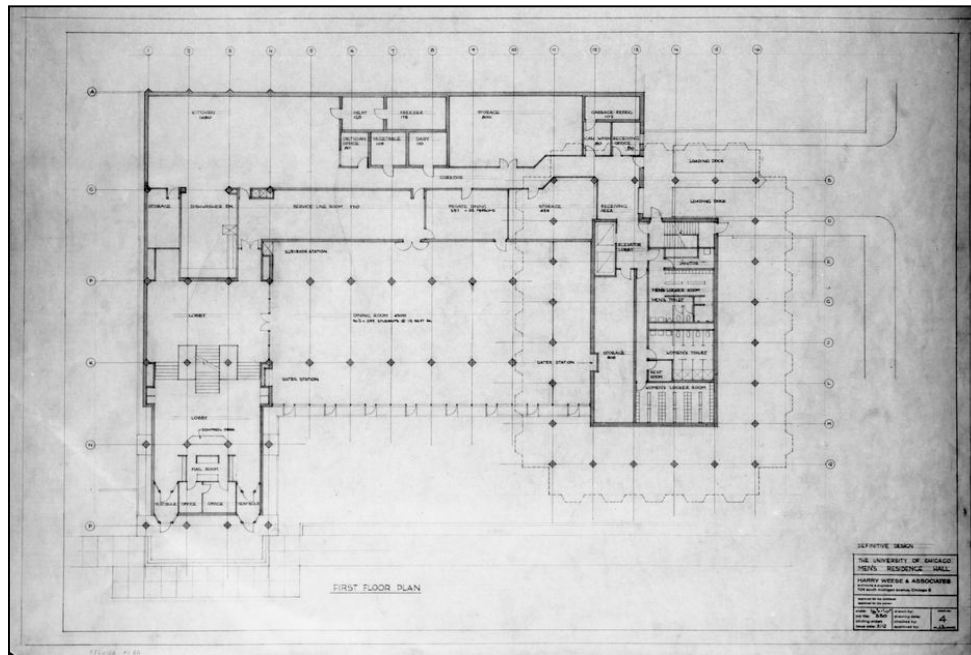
First floor plan of Pierce Hall. E. 55th St. runs left to right at the top of the north-top oriented image; the residential tower is in outline on the right. The pedestrian orientation of the block has been dramatically altered compared to Figure 8, as doors opening on the interior courtyard are segregated from the street. (Buildings and Grounds Photographs. UCSC)
